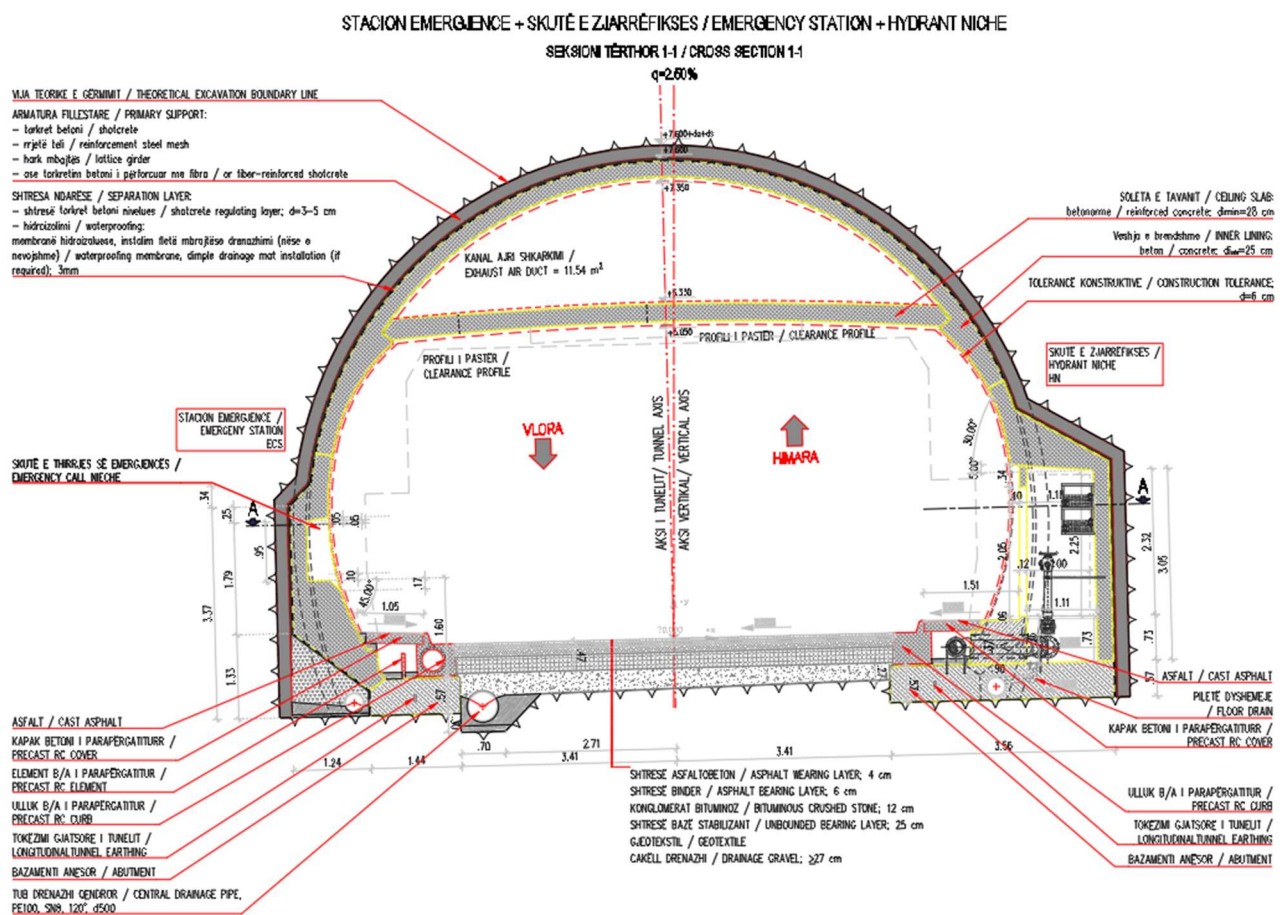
Cross section of the main tunnel at emergency station and hydrant niche
